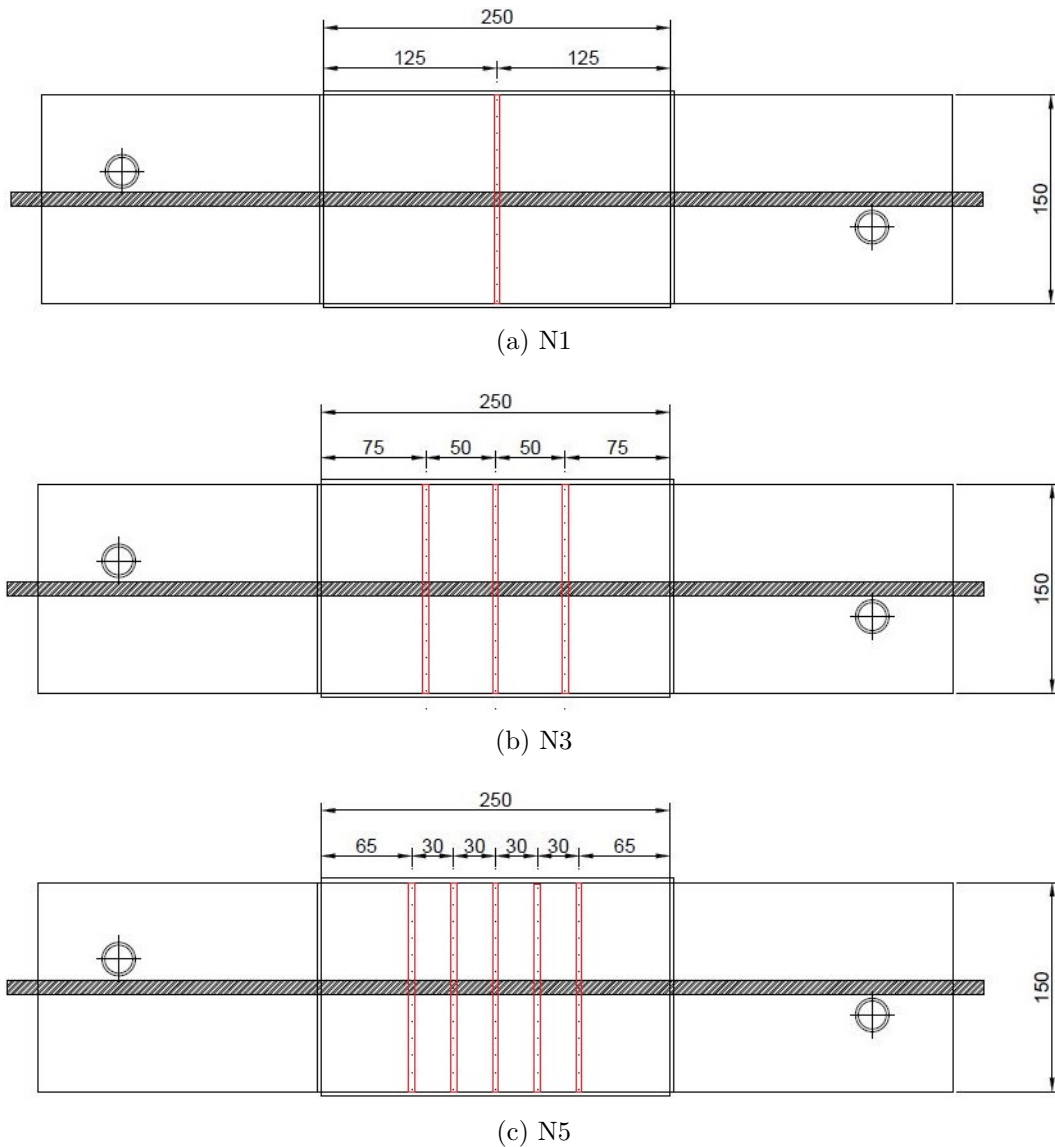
Top view of specimen notch configurations (dimensions in mm)
